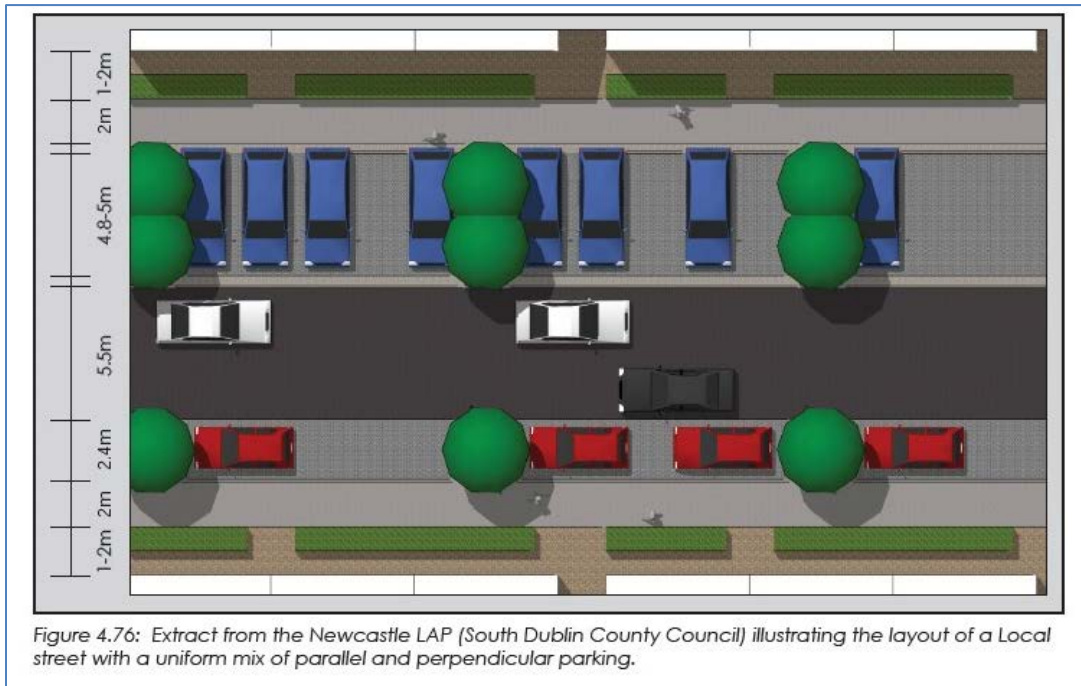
Extract from Section 4.4.9 DMURS 2019
